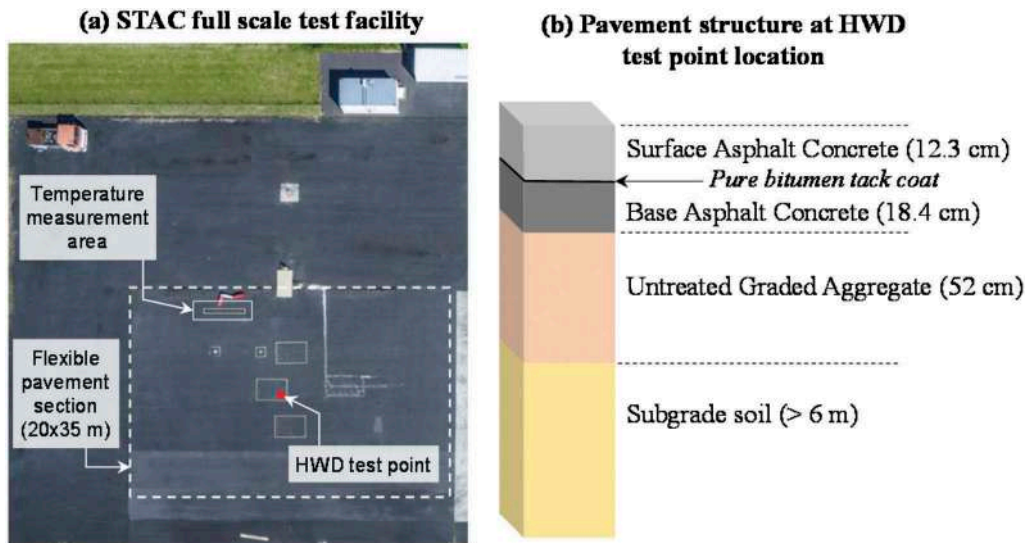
STAC test facility: (a) aerial view (photography DGAC/STAC); (b) pavement structure.
